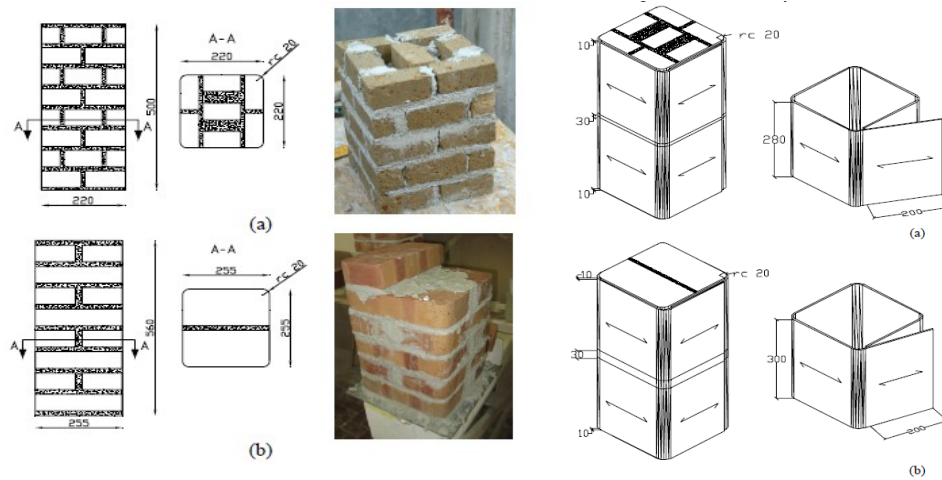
Configuration of masonry columns tested by Krevaikas and Traintafillou (2005)
